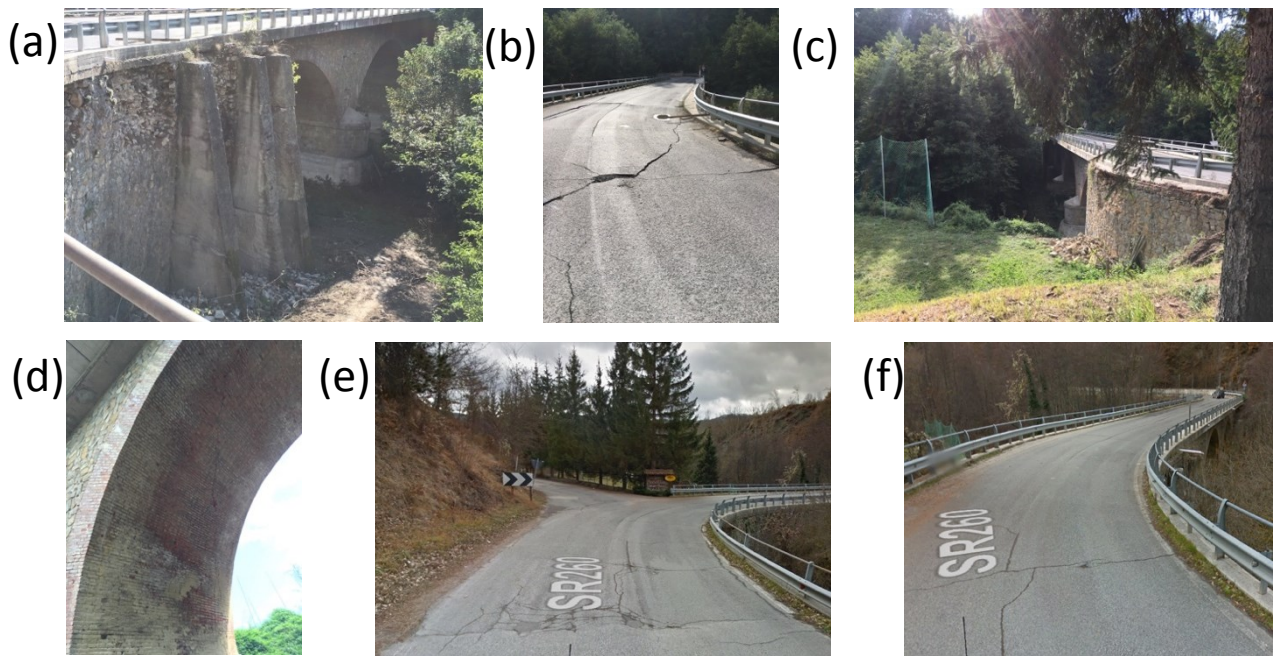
Ponte a Tre Occhi - Masonry bridge along the SR260 in Amatrice (42.620668 deg, 13.290176 deg): partial collapse of two side of the bridge (a, c), road settlement (b), cracks on the arch (d), pre-event cracks along the SR260 (e) and bridge-abutment connection (f) (source (e) and (f): Google maps).
